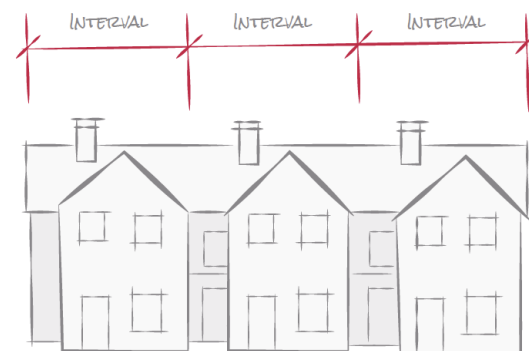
Design facades to articulate individual building entrances (4.4.a).
